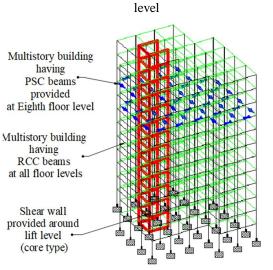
Model OPSC-BVIII - General Structure with PSC beam provided and interchanged at eighth floor
